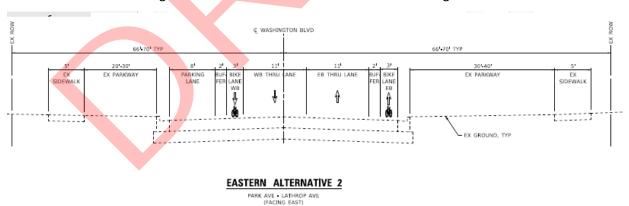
Eastern Typical Section Alternative 2 Washington Blvd.
